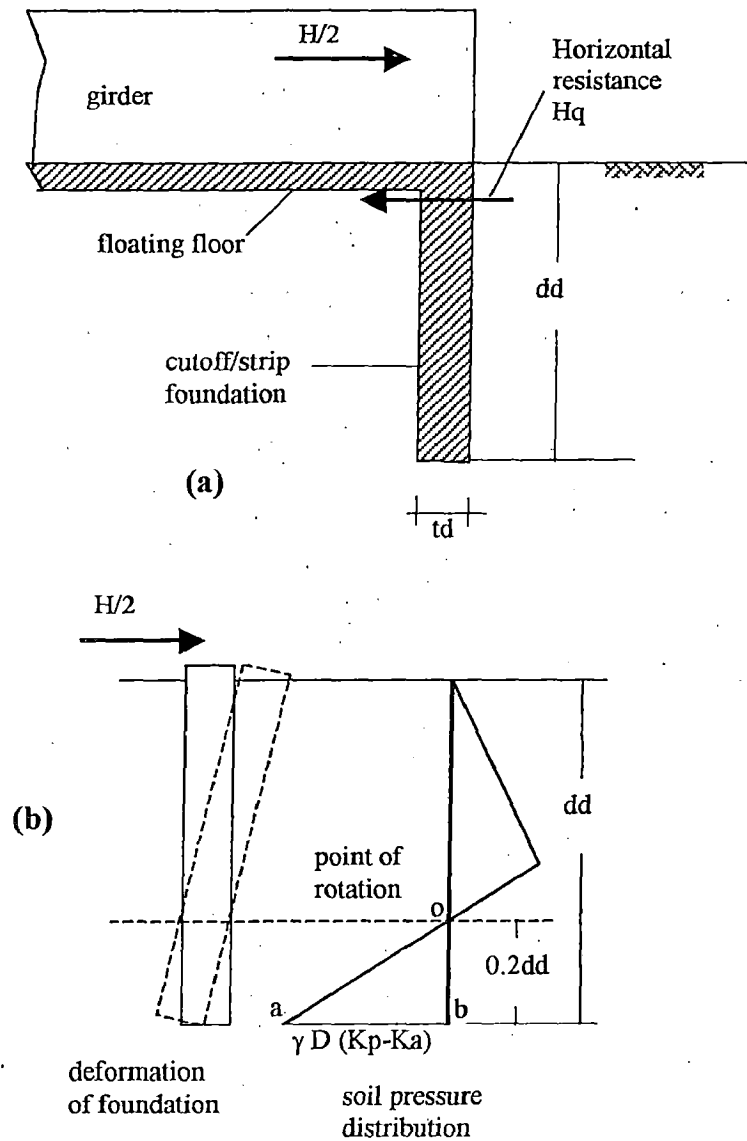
Detail of Foundation and Horizontal Resistance
